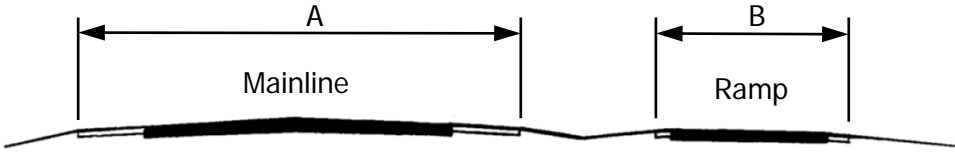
Approach roadway cross-section view for a mainline and a ramp that are carried across one bridge.
